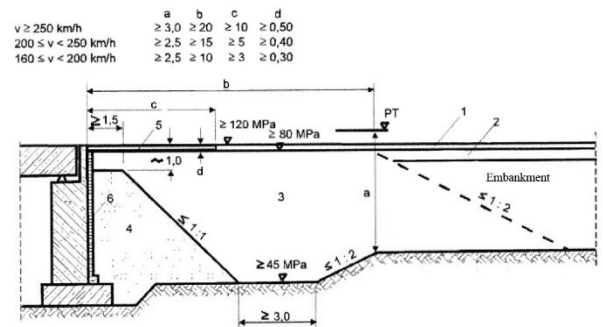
Transitional section in the embankment of the newly built line (German railways) [12]: 1 - track protection layer, 2 - track foundation, 3 - well-grained soil ($U \geq 5$) compacted to $IS \geq 1.0$; 4 - soil stabilized with 3% cement addition and compacted to $IS \geq 1.0$; 5 - impermeable layer, 6 - wall abutment insulation and filter layer
